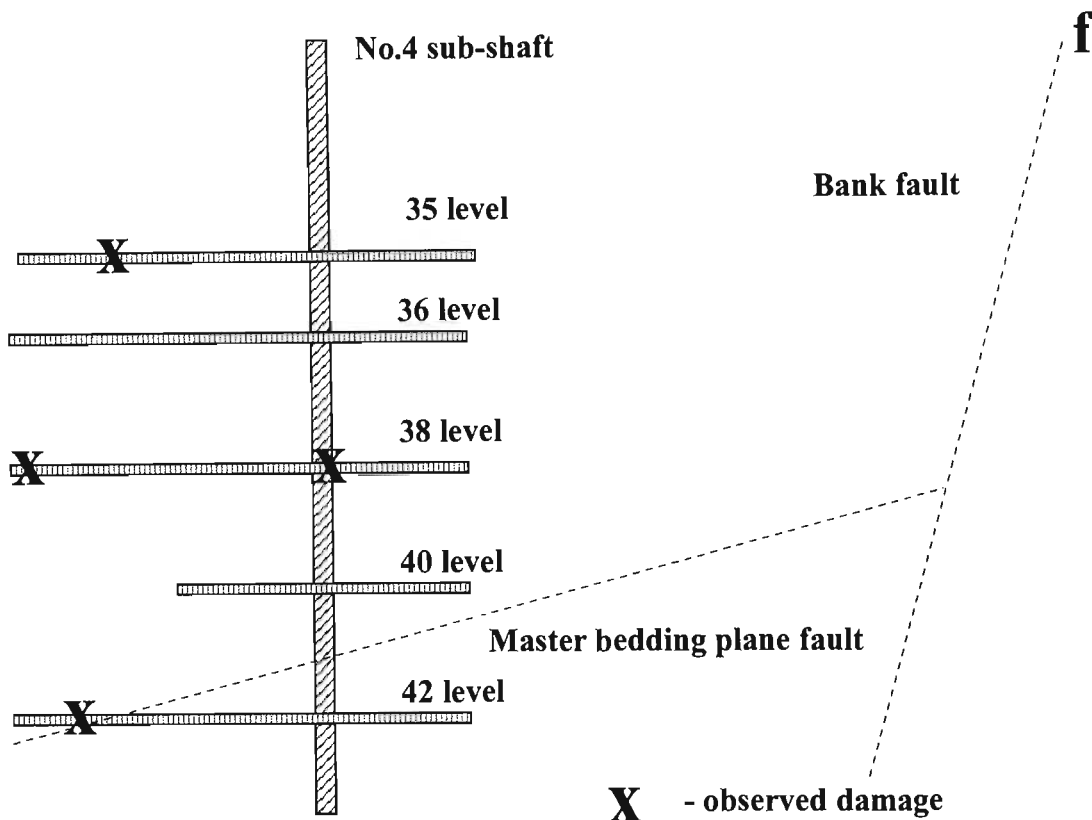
Schematic section of shaft layout and major fault planes with distribution of damage.
